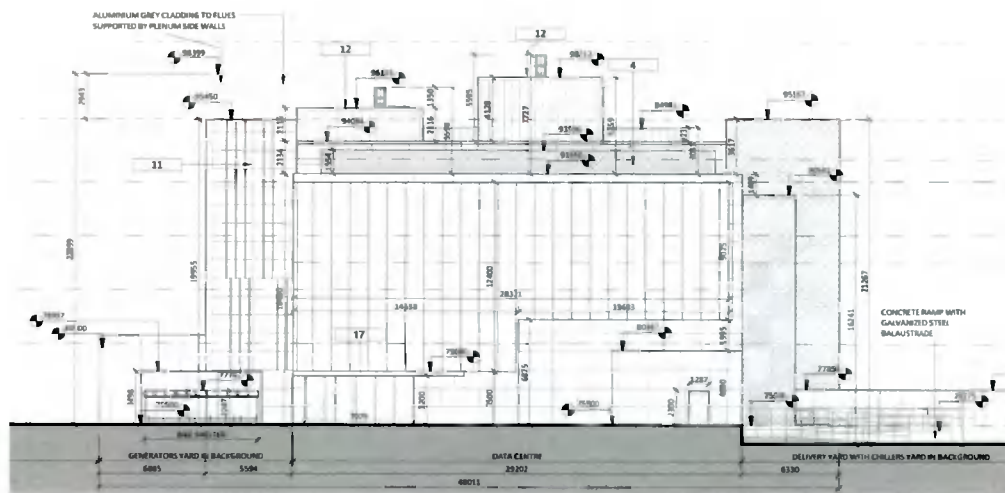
Proposed West Elevation (facing Falcon Avenue)
